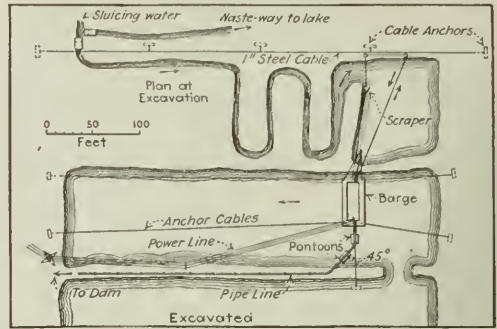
PLANT LAYOUT FOR HYDRAULIC FILL OPERATIONS
